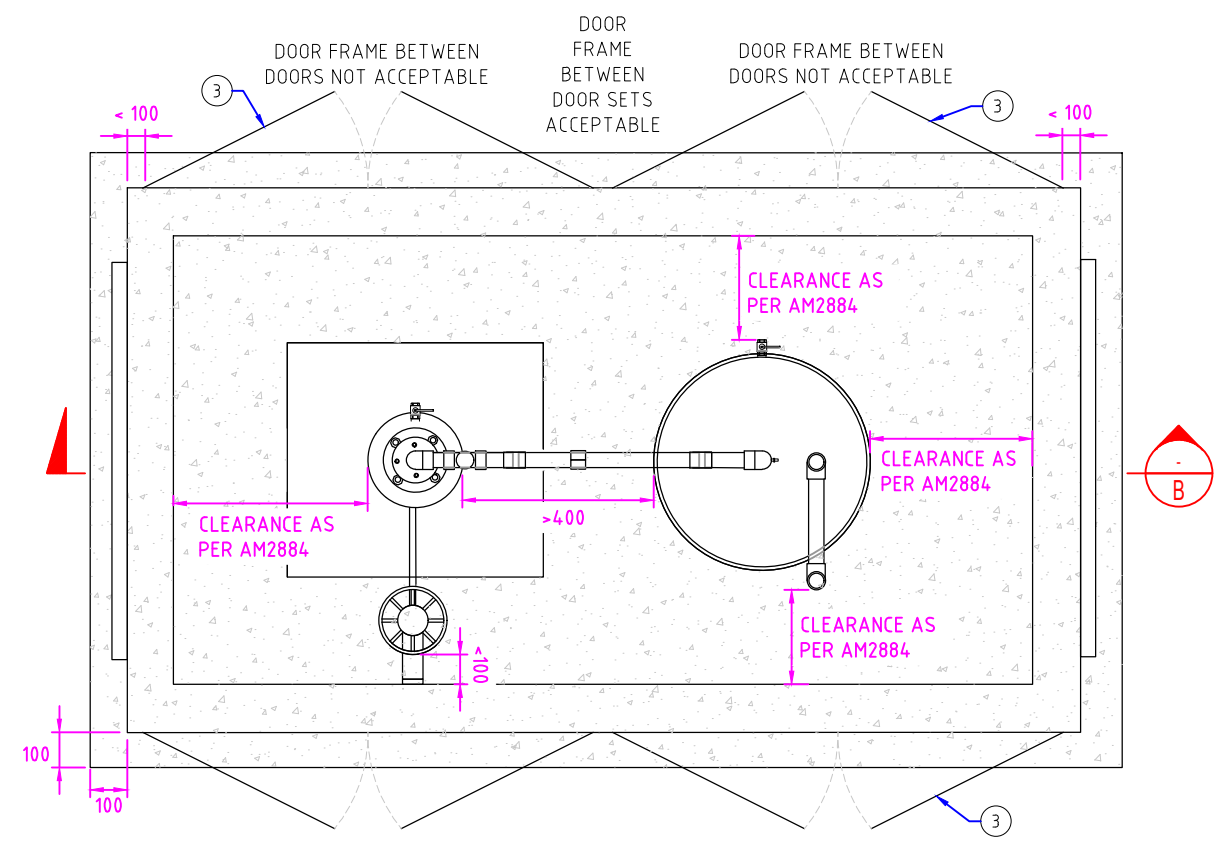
PARTIALLY ABOVE GROUND AIR VALVE AND CARBON CANISTER ASSEMBLY (PLAN LEVEL IS JUST BELOW CABINET ROOF)
